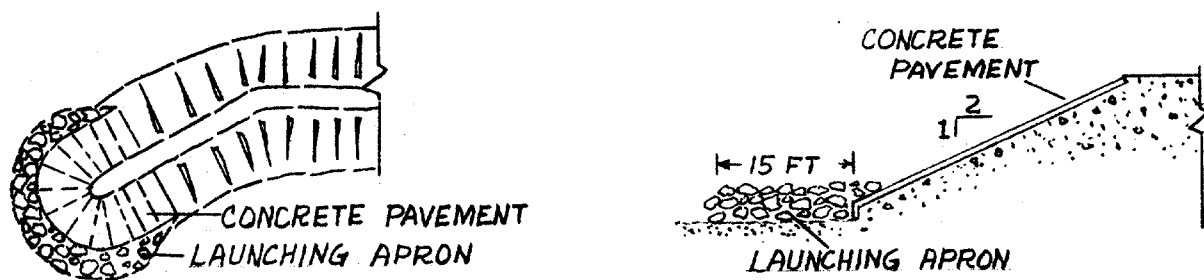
Plan, left, and cross section, right, of revetment at tip of spur No. 1.
